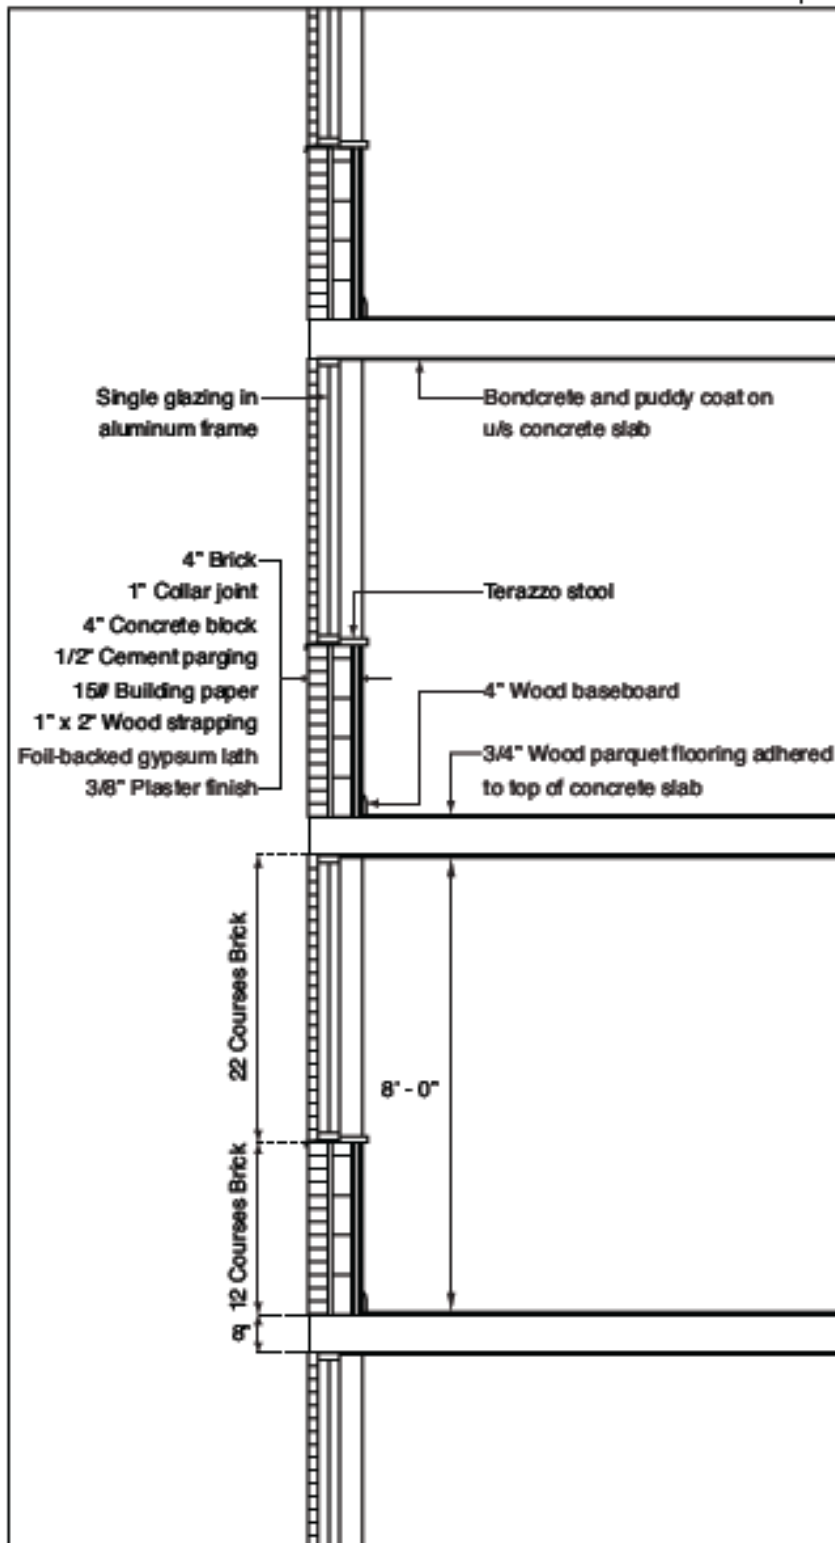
Wall Section (Kesik & Saleff, 2009)
